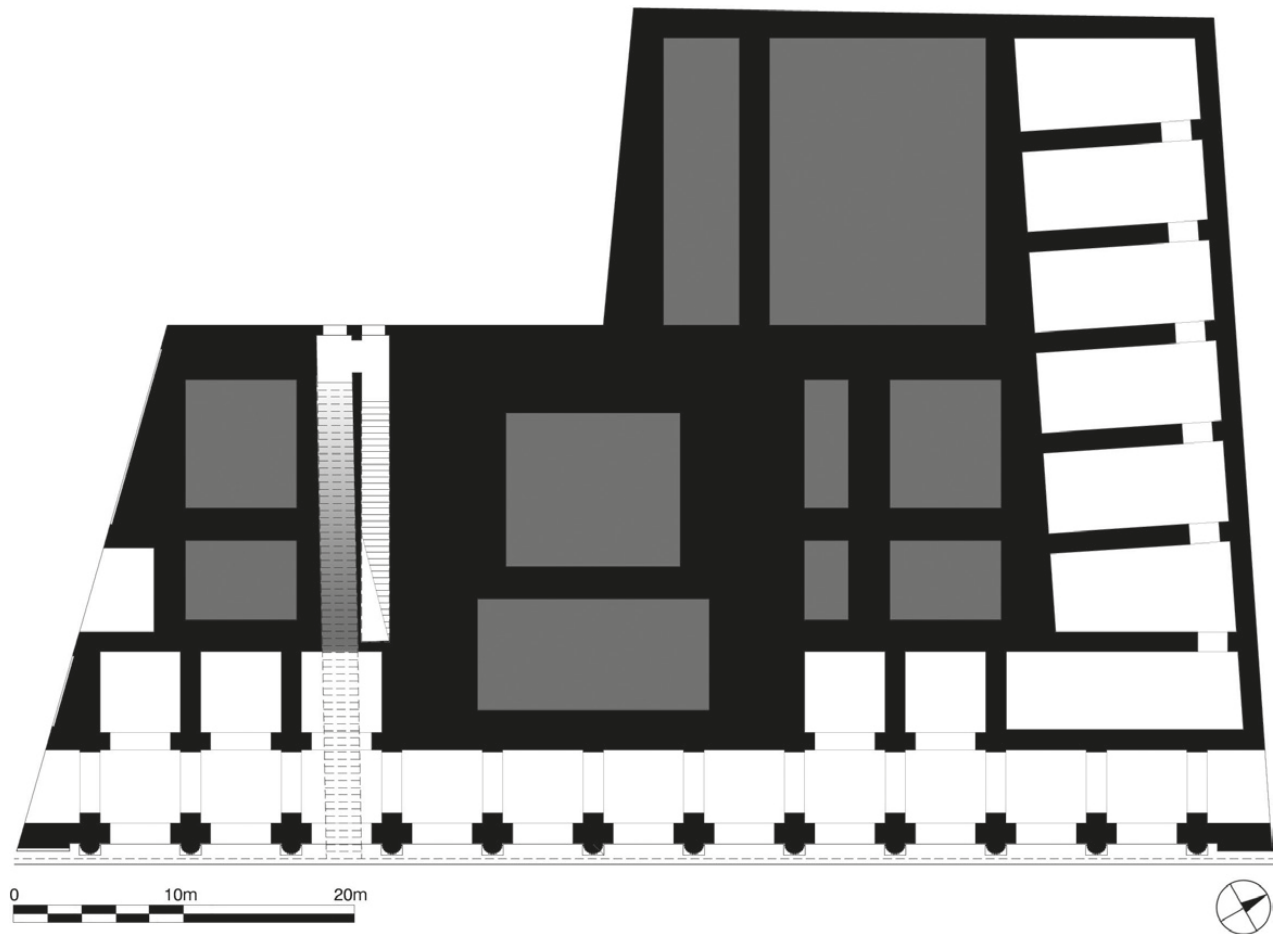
Substructure and temples on the Capitoline saddle, ca. 78, plan (John Burge)
